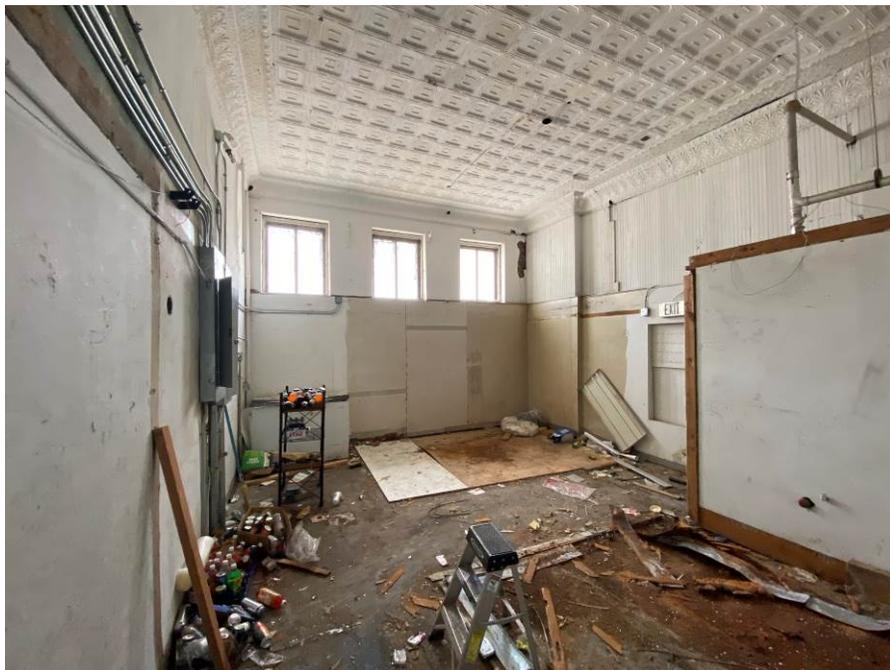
Interior General Condition of Ground Floor at 84 North Main
